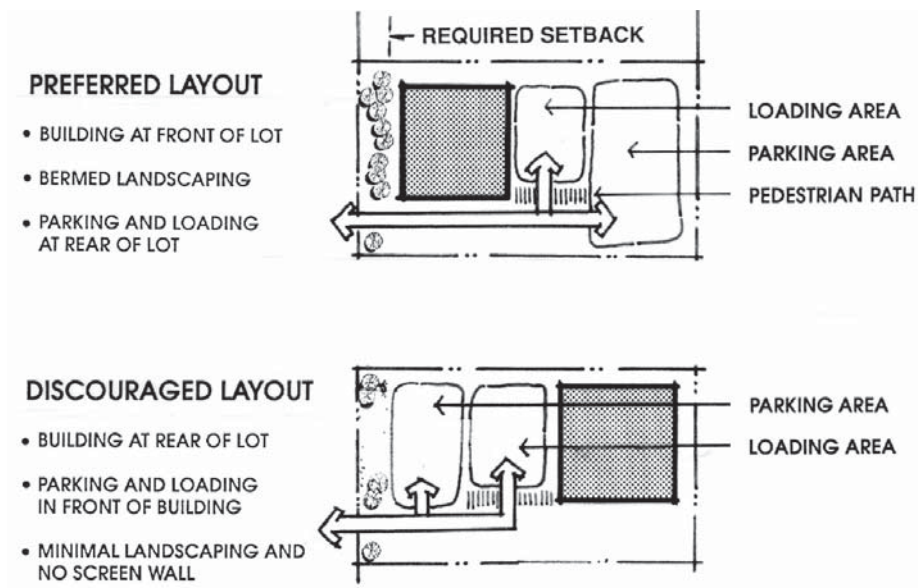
A successful site design locates service areas and parking to the rear of the building.
